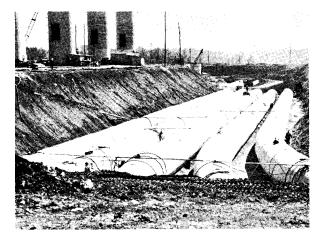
Reinforced concrete condenser water intake conduits, 96-inch id, for units 5-9. The pipe was precast by contract on the job. Joints were steel faced and made watertight with flexible round rubber gashets.
